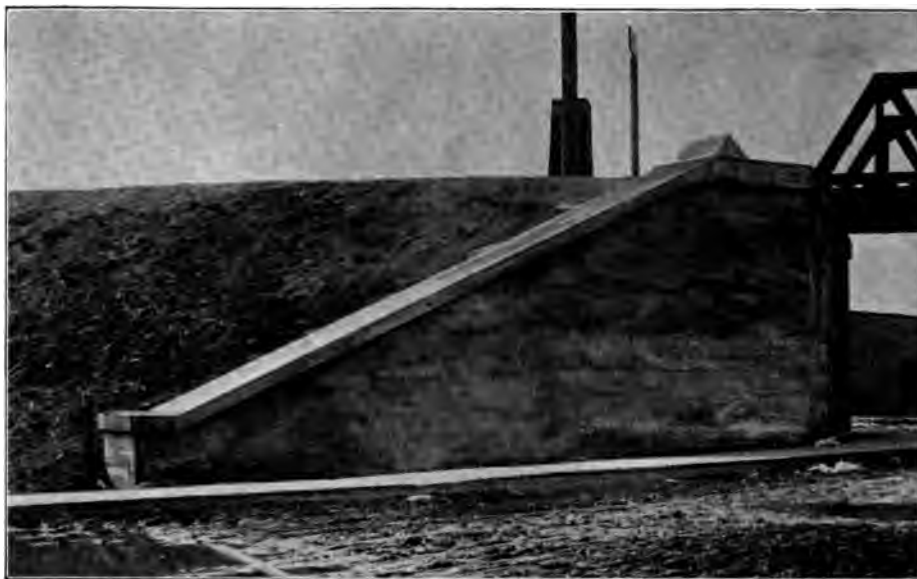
SOUTH ABUTMENT BRIDGE ON KANKAKEE RIVER, REINFORCED WITH CONCRETE.
